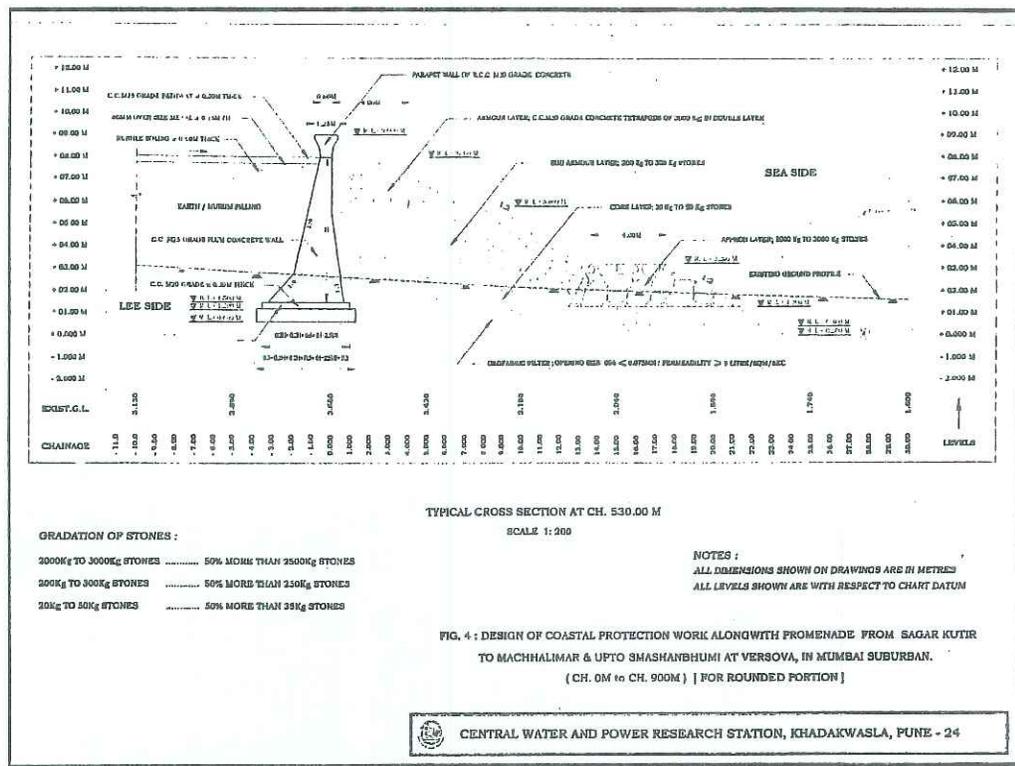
(A) layout plan Typical Section at CH. 530.00M (For Rounded Portion)
